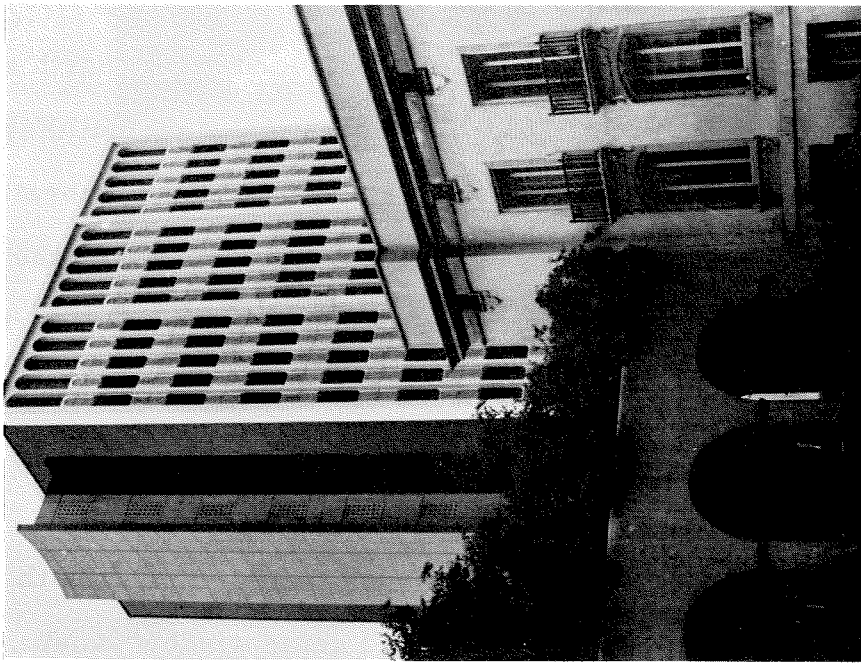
North elevation of the Millikan Library building on the Caltech campus, a 9-story, plus enclosed roof, concrete shear-wall structure. The north and south faces of the building have precast concrete panels bolted to the floor beams.
